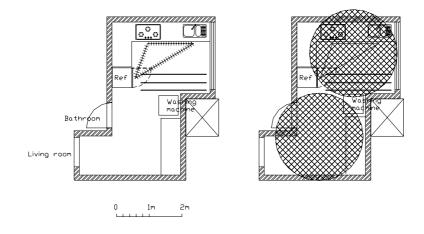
Floor layout analysis of Kitchen 8182-07, layout 1.
